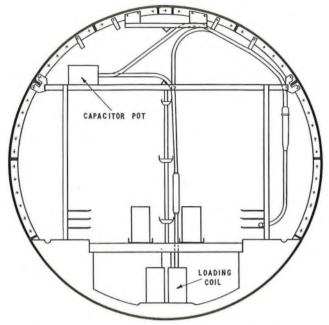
Section through 19 ft 6 in diameter loading-coil chamber
